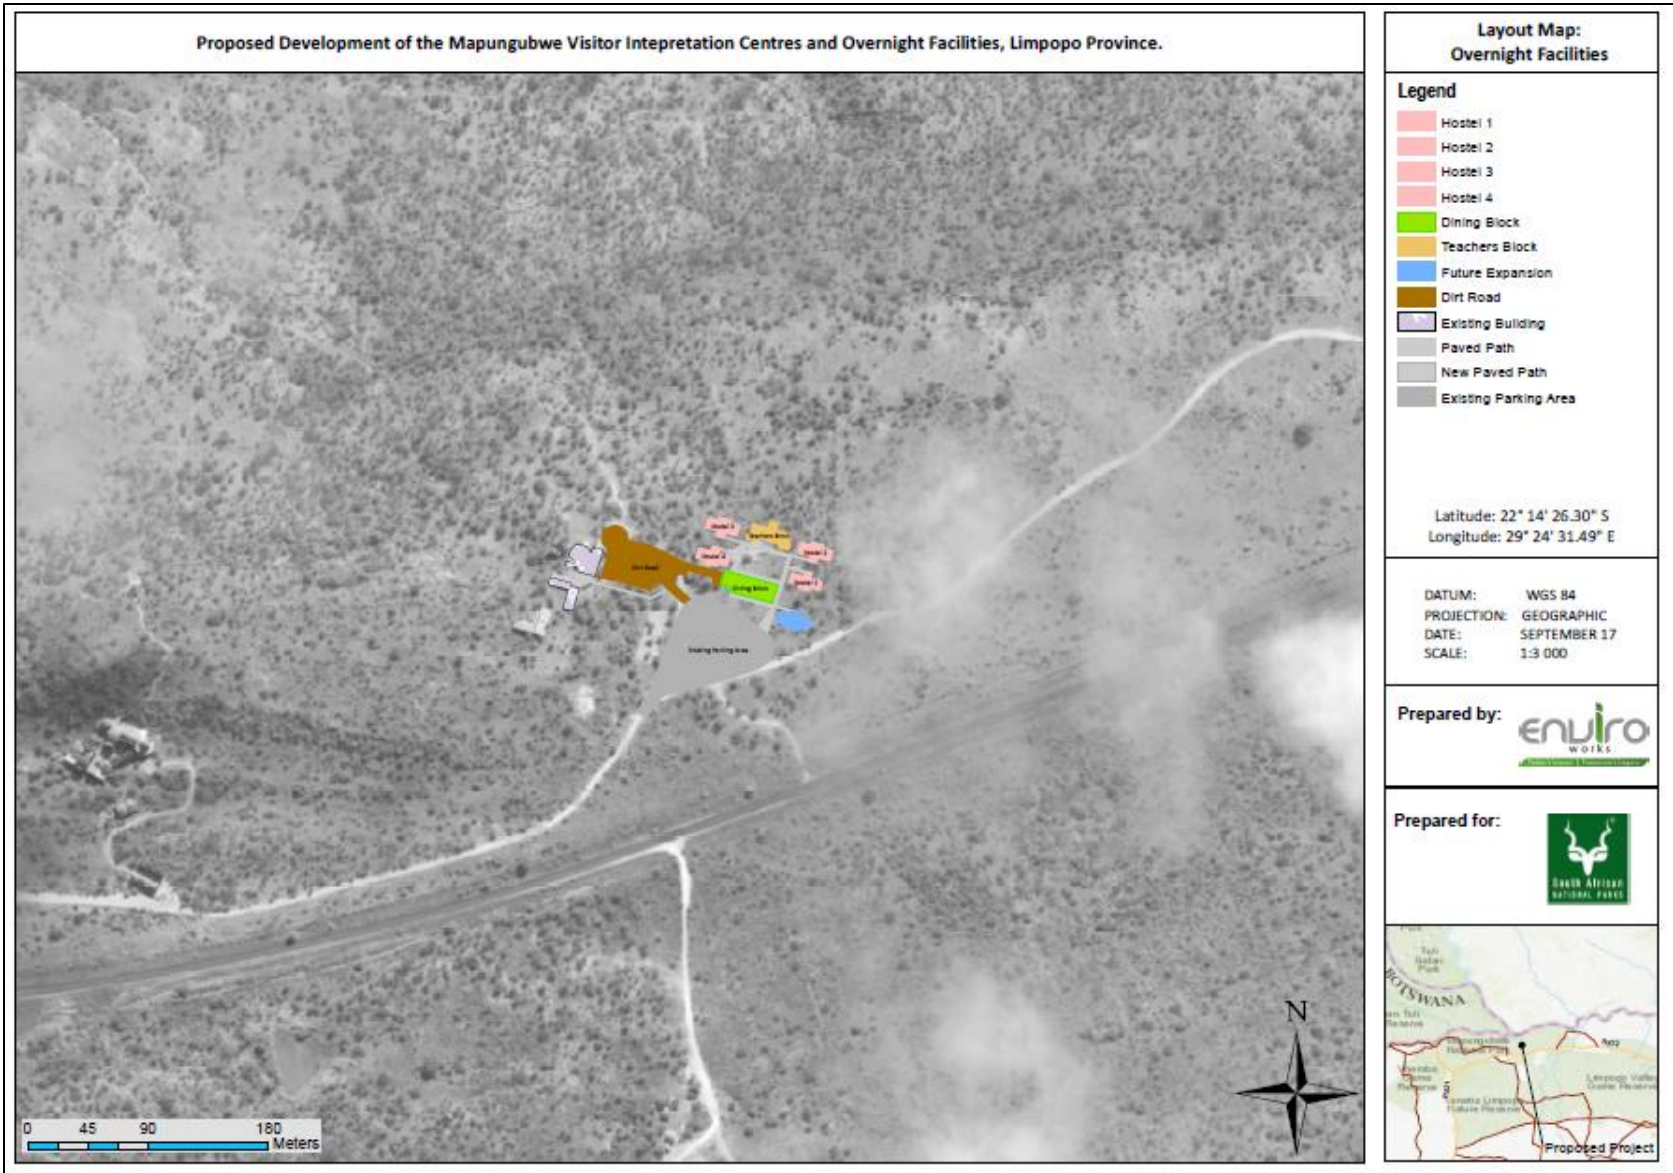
Layout of the proposed overnight facilities, Hostel Accommodation
